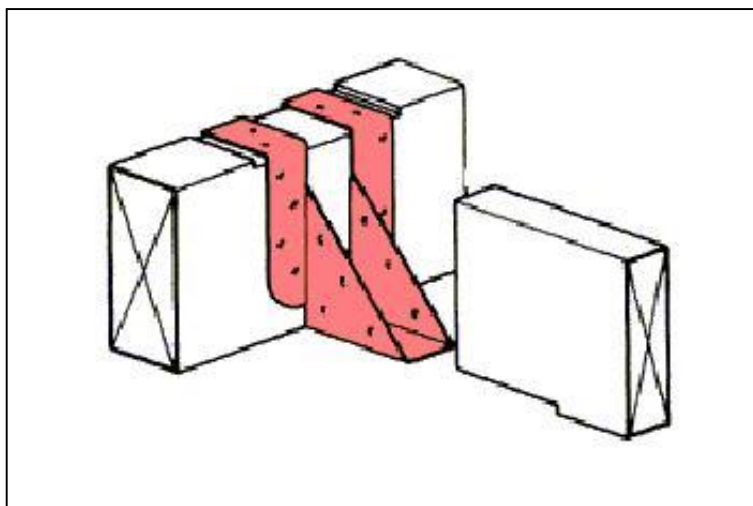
Typical Solid Timber Joist Hanger Detail.
